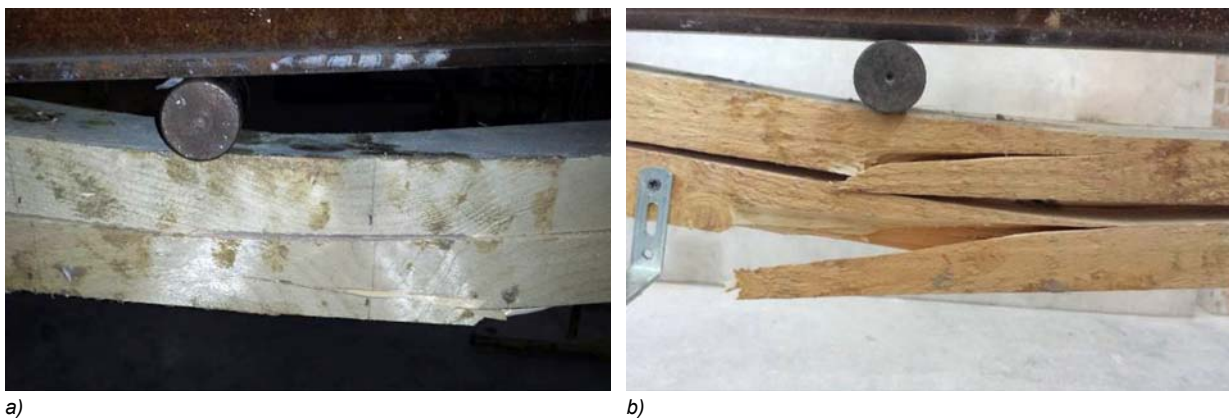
Timber tensile-flexural failures (cut in half beams): a) only in the lower half, b) both in the lower and upper halves
